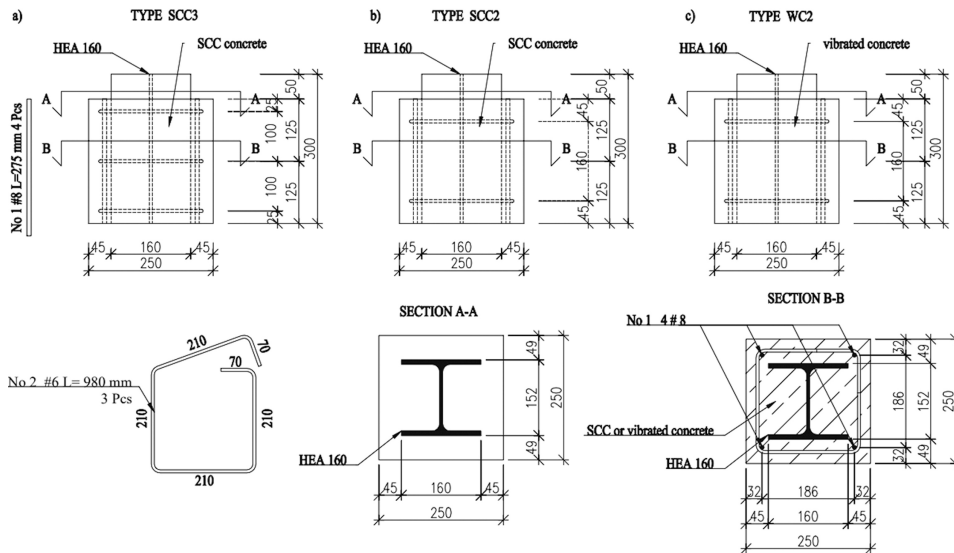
Cross-sections of tested columns: a) made of SCC concrete with 3 stirrups, b) made of SCC concrete with 2 stirrups c) made of vibrated concrete with 2 stirrups
